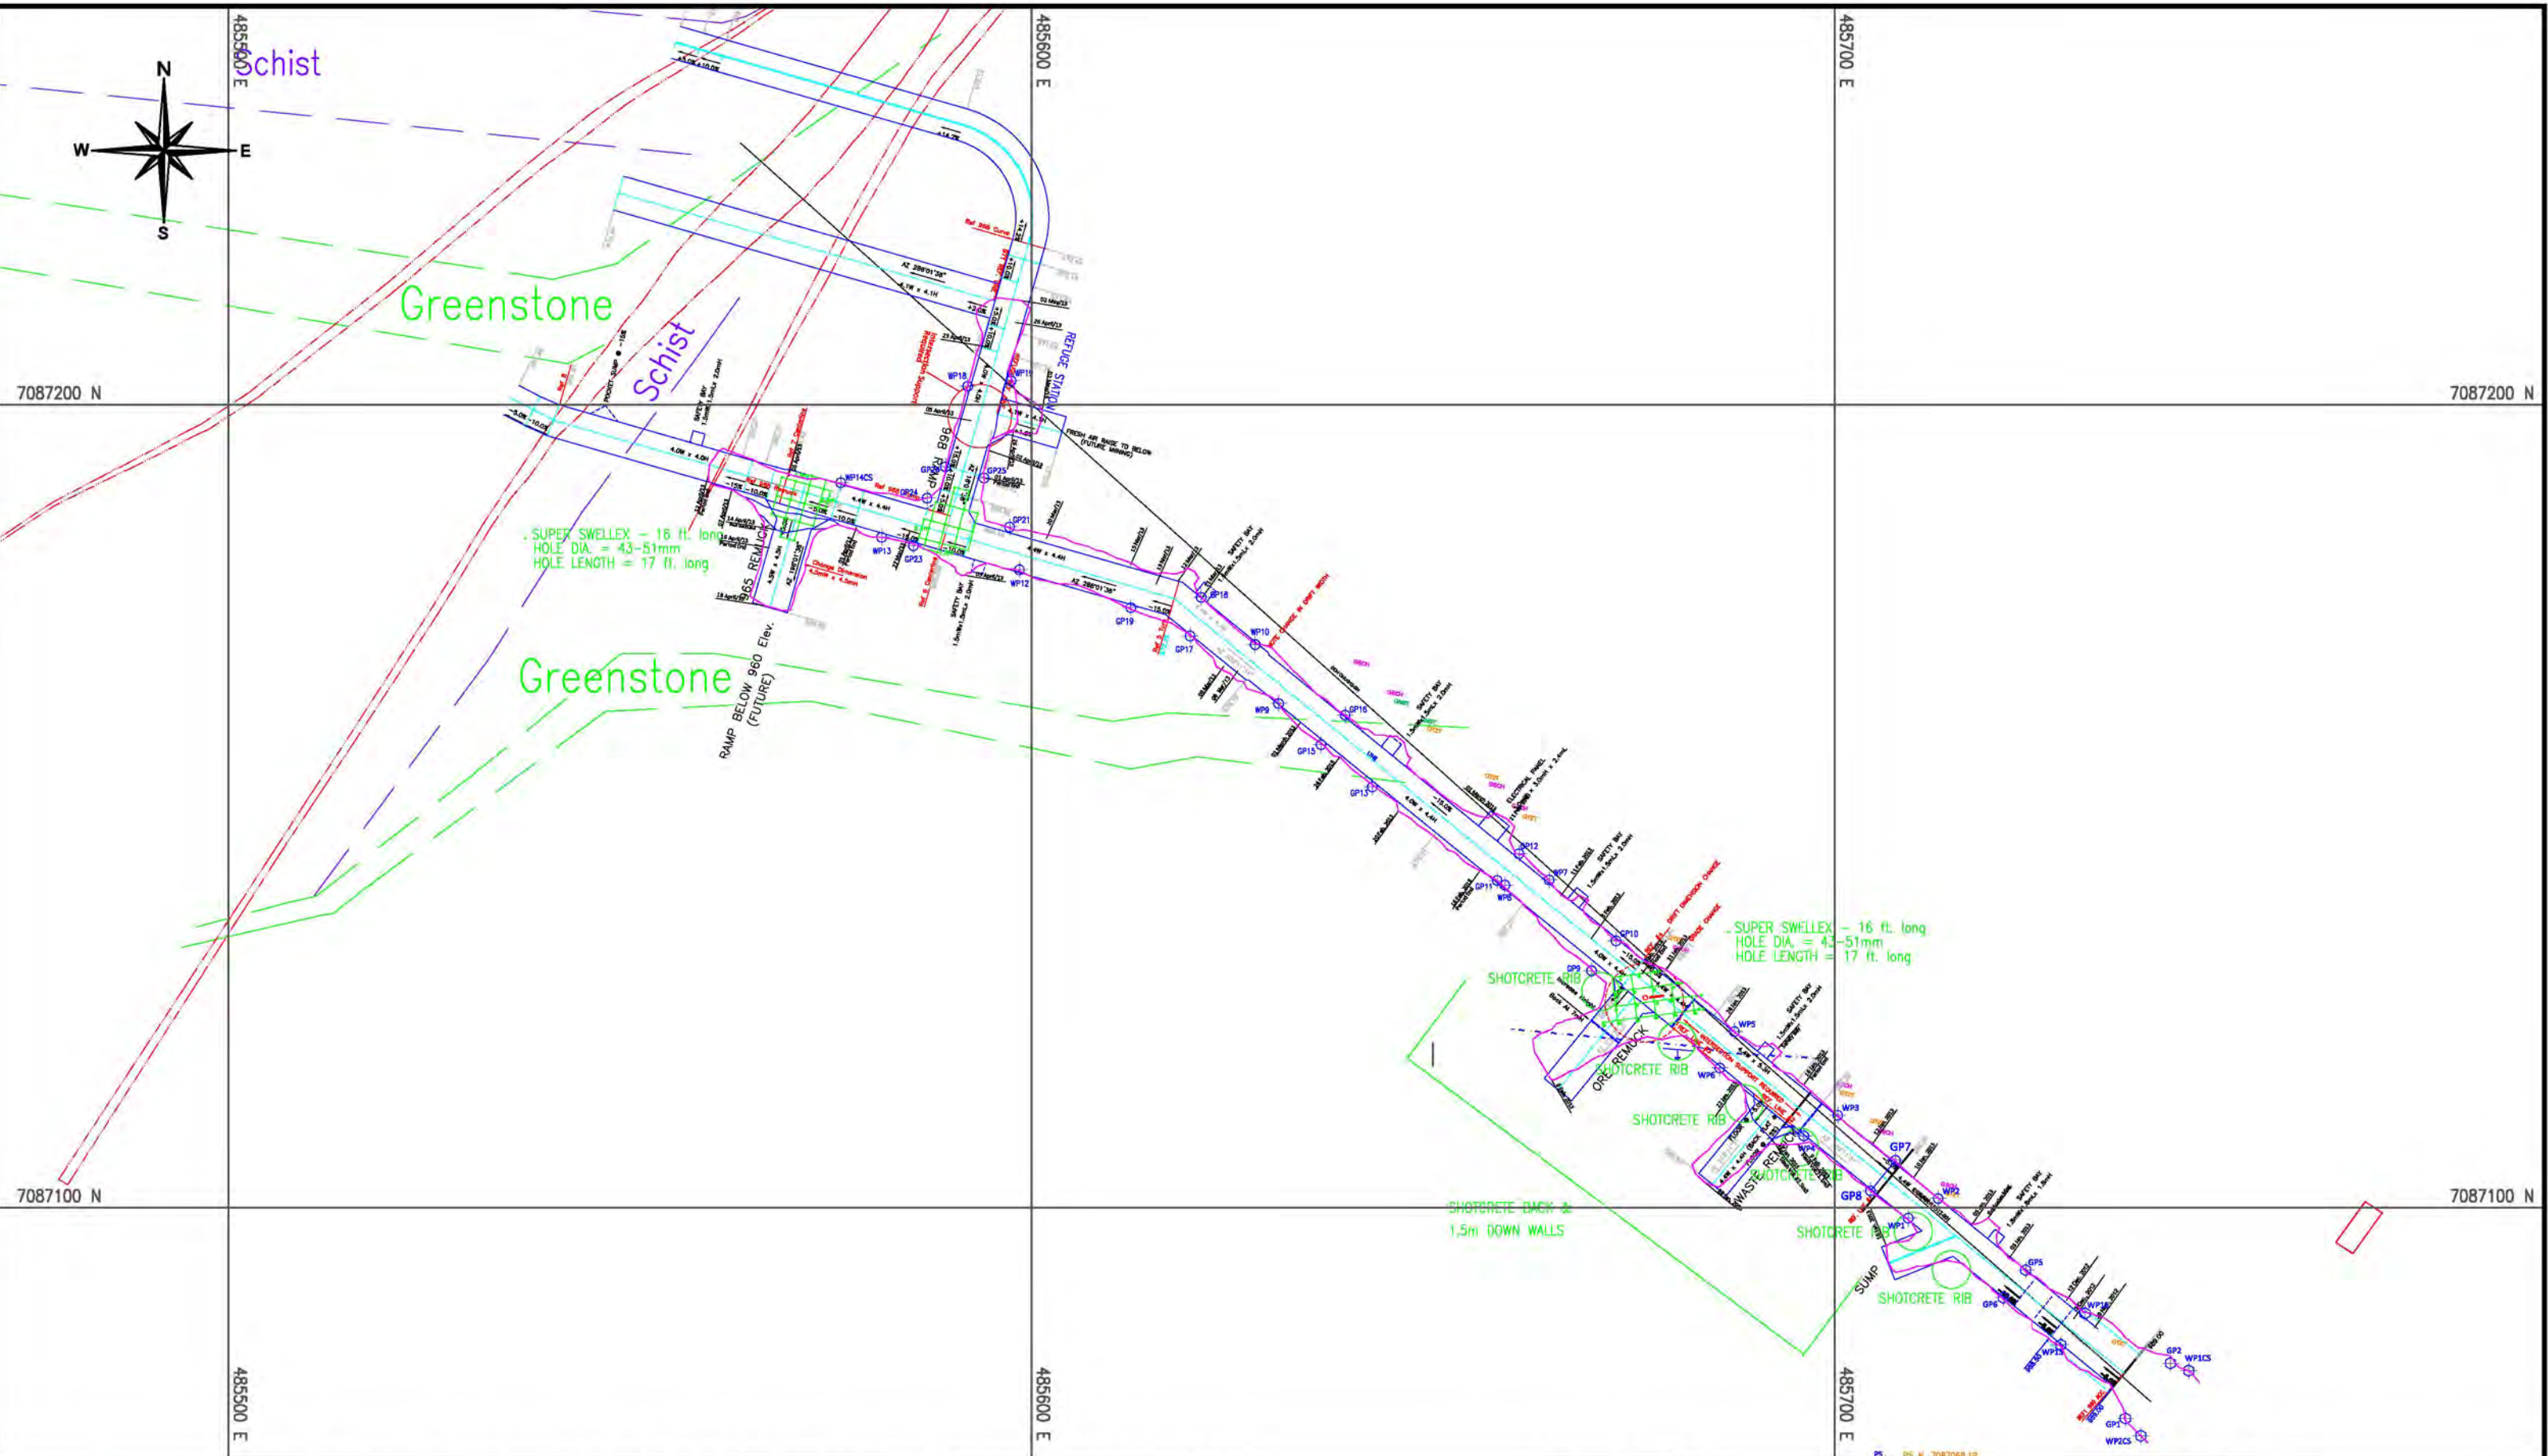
ONEK 990 MINE LAYOUT
